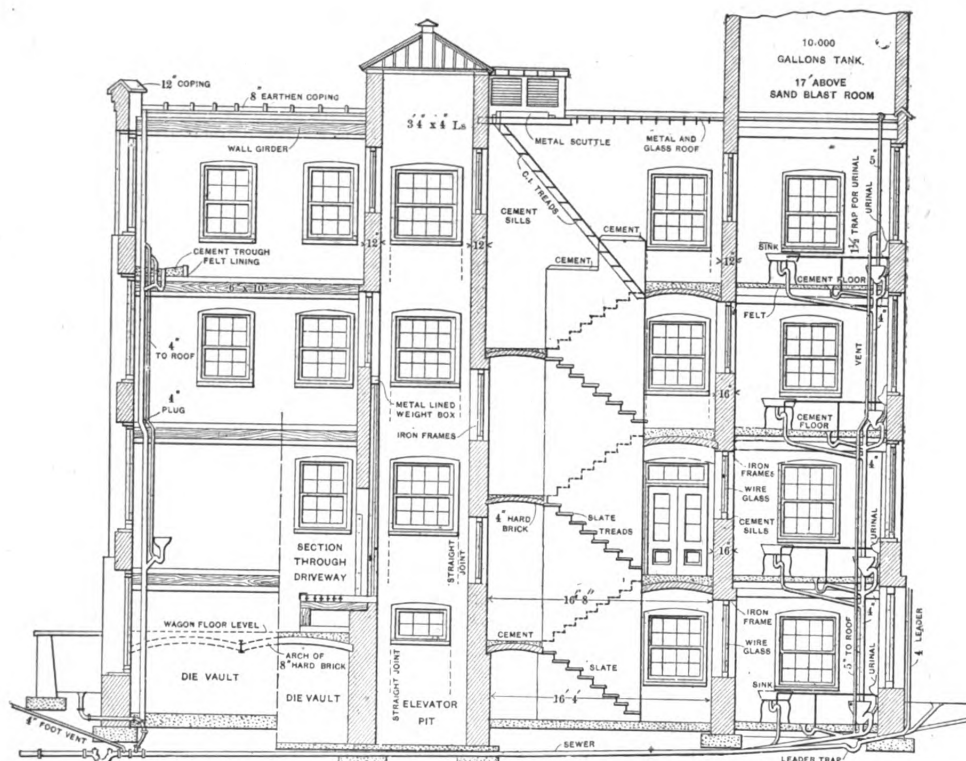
Vertical Cross Section through Building taken on Line of Stairs and Elevator Shaft.
